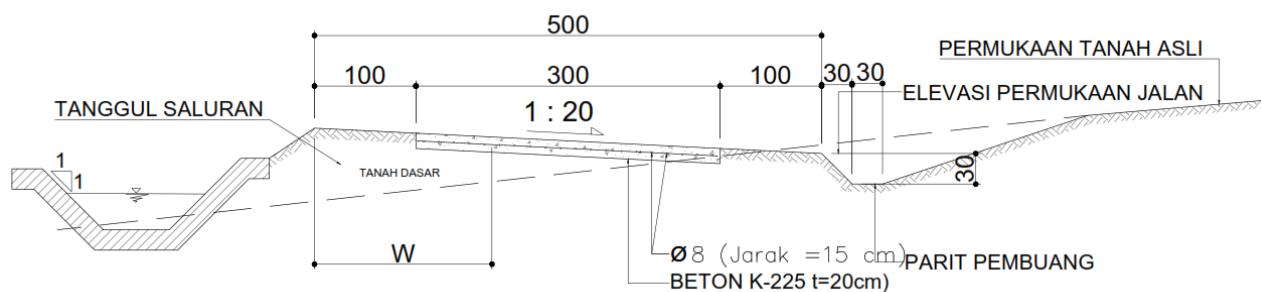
TYPICAL INSPECTION ROAD OF IRRIGATION CANAL OF CONCRETE K-225
